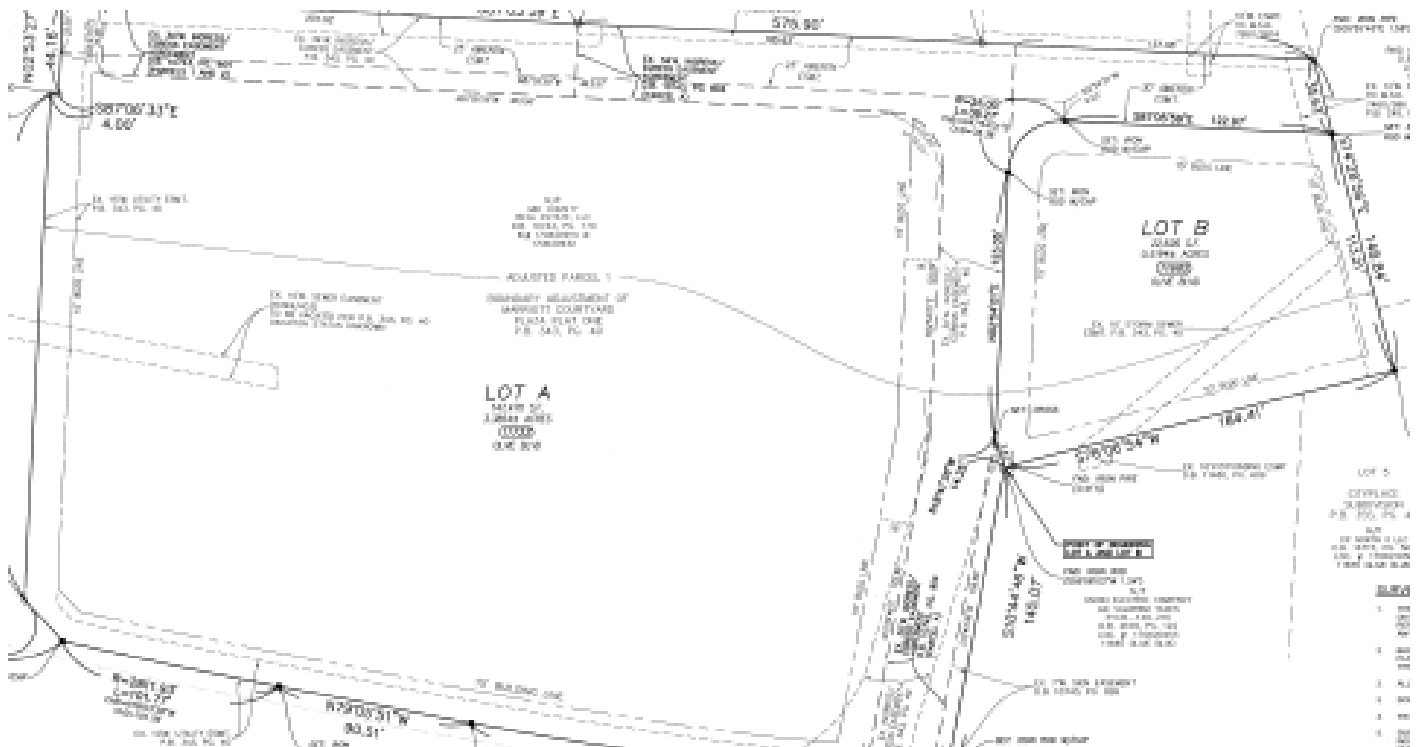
Close-up of the Plat showing Lot A and Lot B of the proposed subdivision
